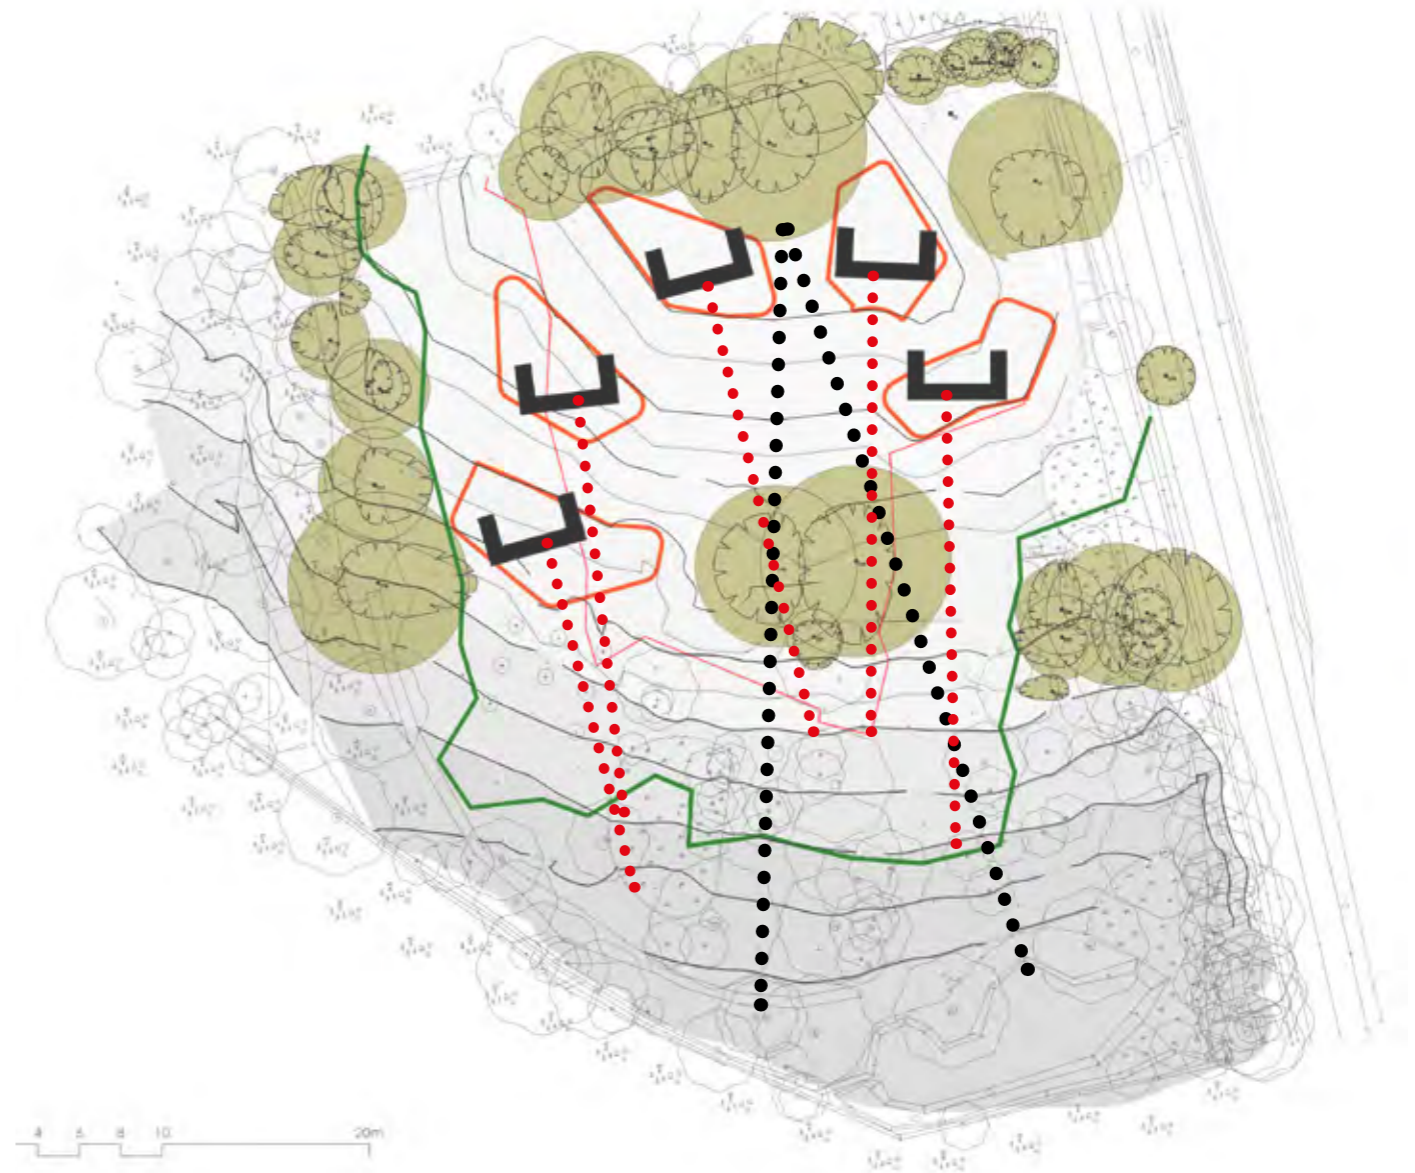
DEVELOPMENT PLATEAUS, FACADE AND INDIVIDUAL PLOT VIEW DIRECTIONS ARE SHOWN
